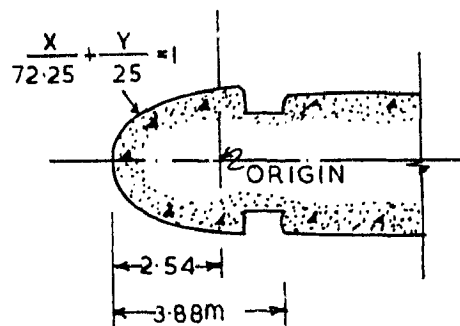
PIER NOSE-DALLES DAM SPILLWAY
